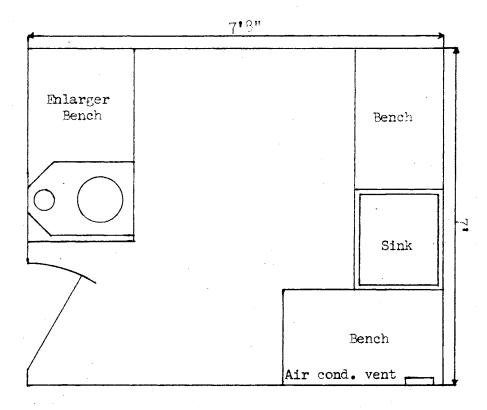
DARKROOM FLOOR PLAN BLACKWELL JOURNAL TRIBUNE
